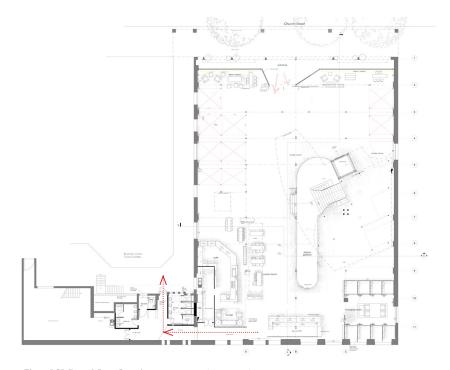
Ground floor fire exit route-not to scale (Author 2013)
